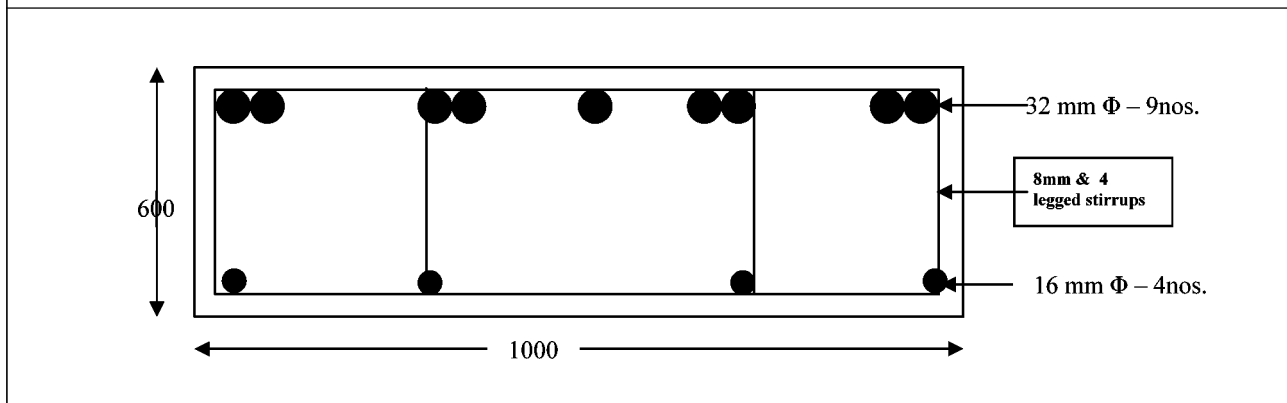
Detail of Reinforcement in Meter Panel at Andheri Site
